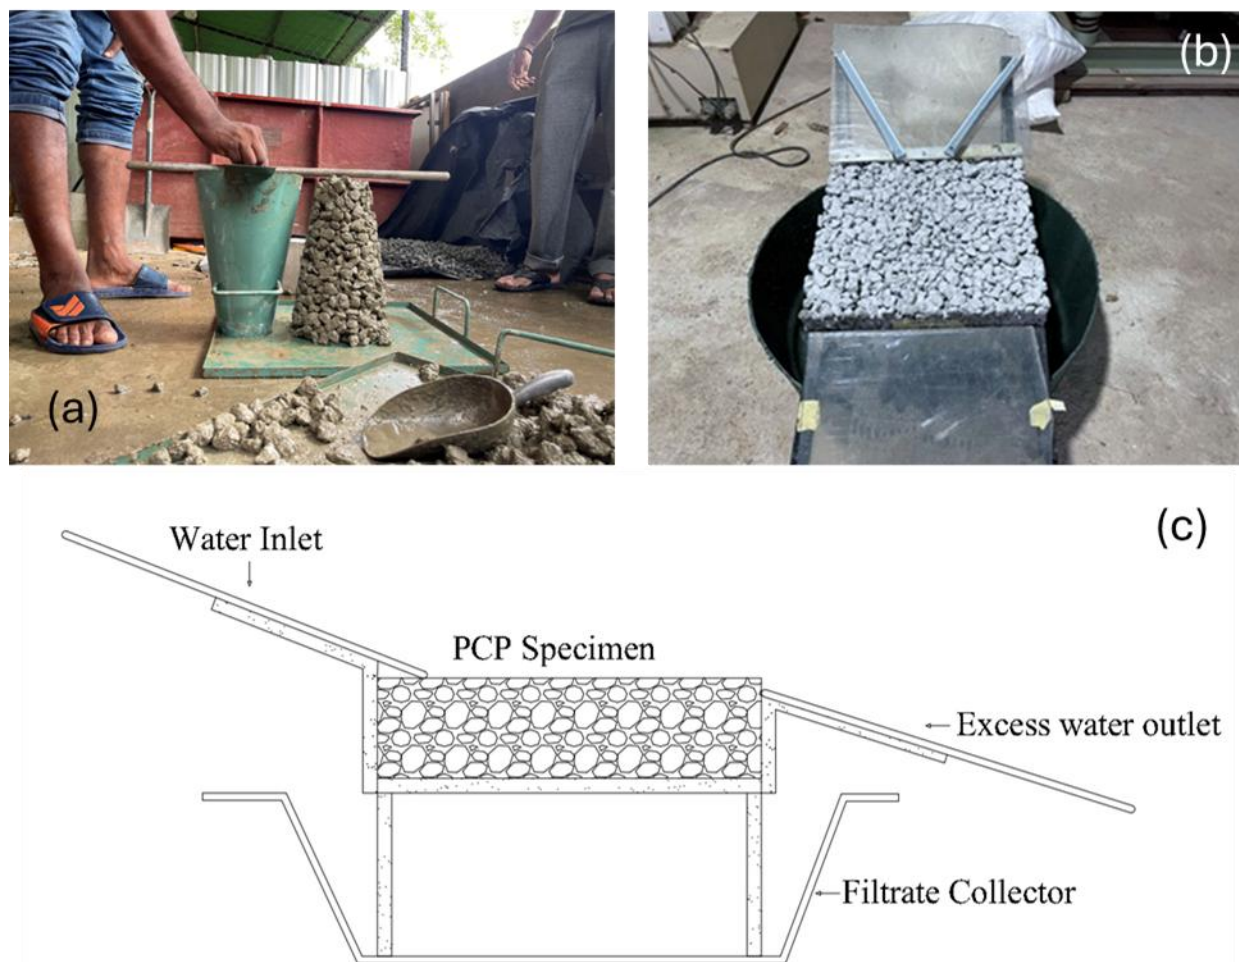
Experiments carried out. (a) Slump test for porous concrete; (b) Porous pavement for water quality test; (c) Porous pavement water quality test apparatus.
